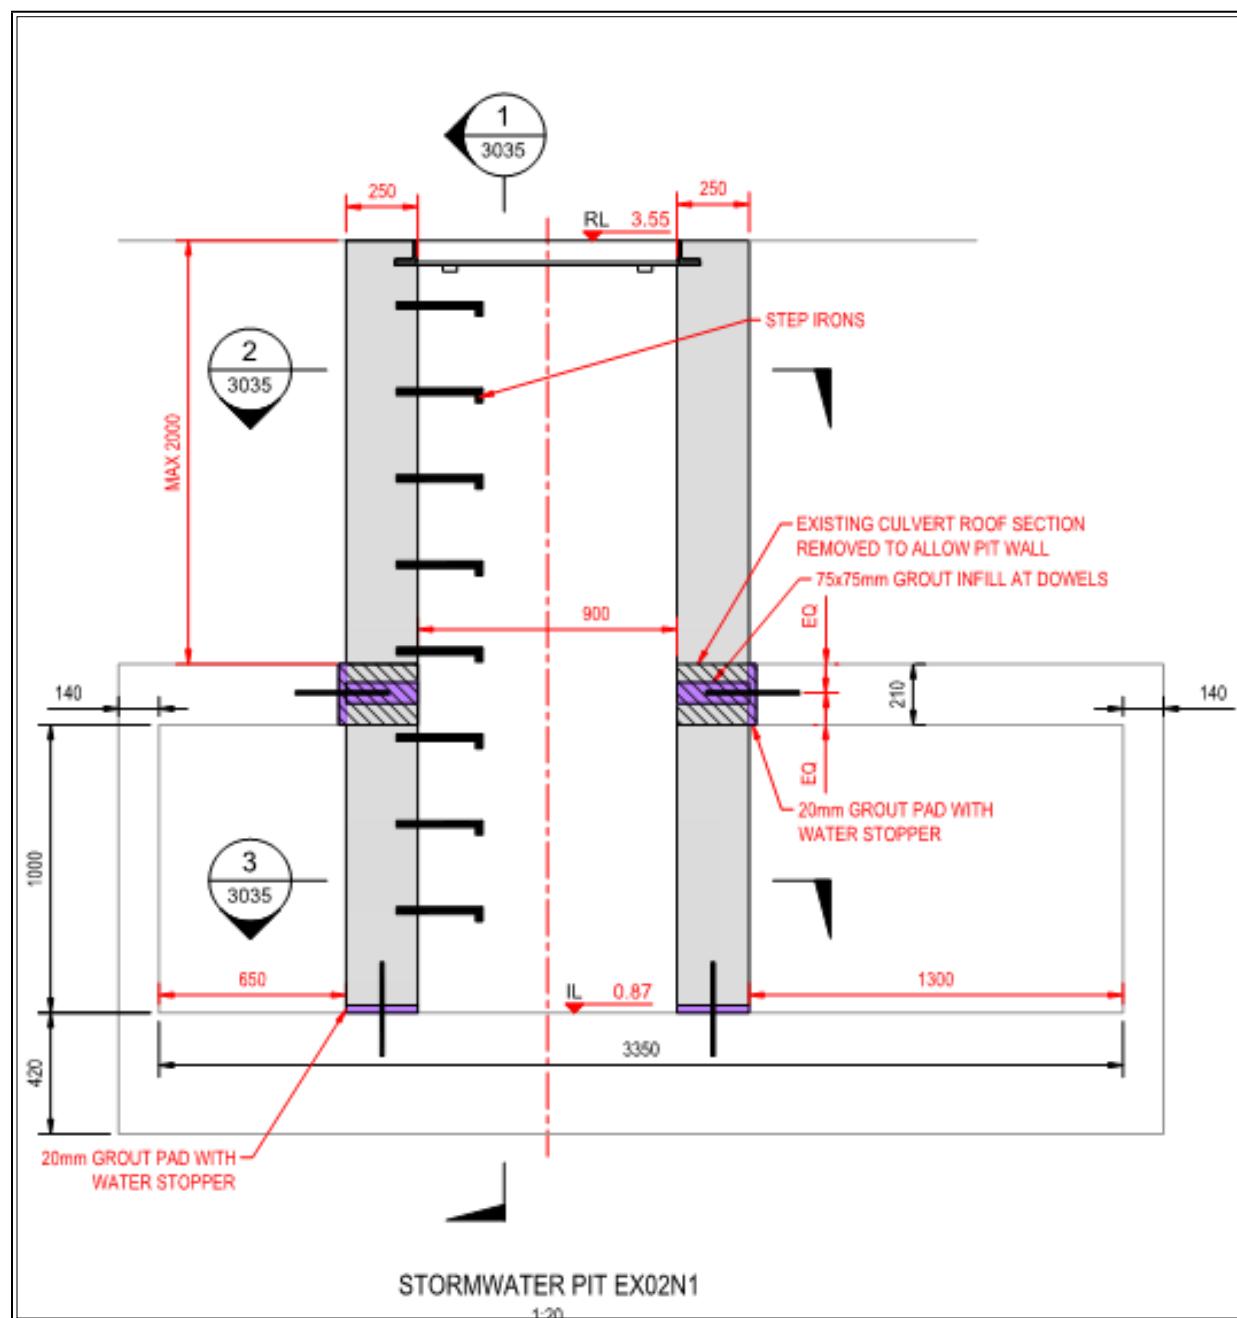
Elevation of the proposed Drainage Pits (Source: Mott Macdonald, 2023)
